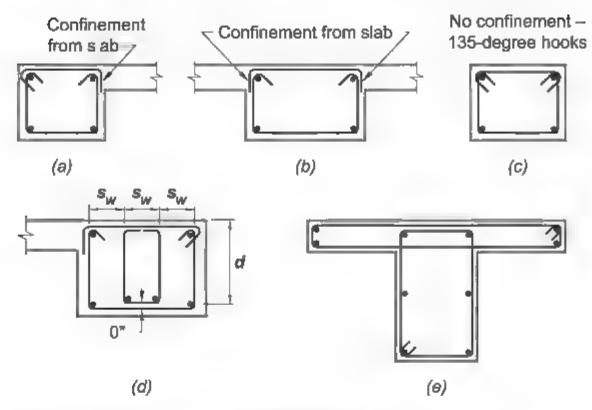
Longitudinal reinforcement distributed around beam perimeter with closed stirrups
